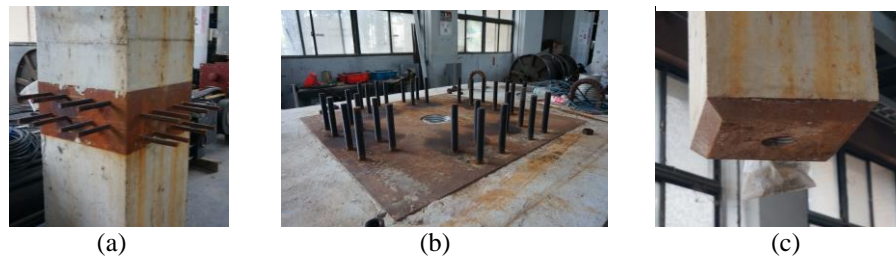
Photos of the precast segment of the proposed specimens (a) column segment; (b) foundation segment; (c) base of the column segment.
